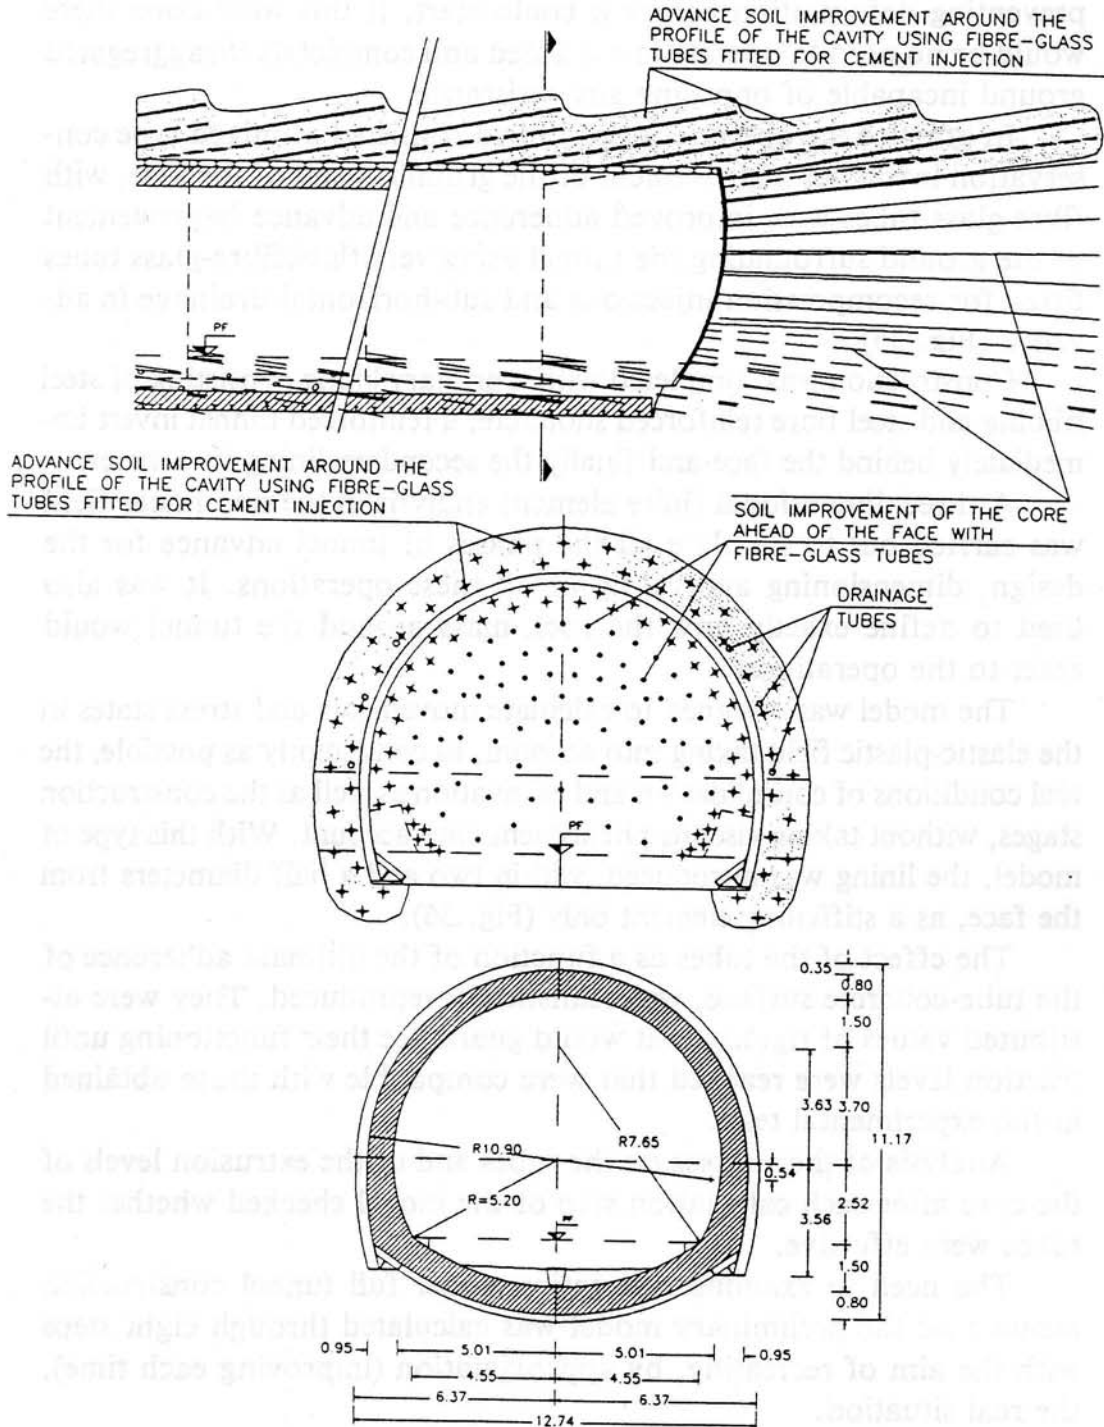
San Vitale Tunnel: scheme of the interventions of stabilisation for the full face excavation
